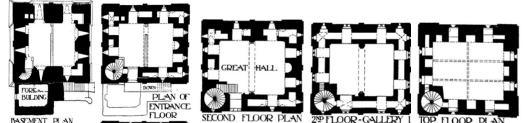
Floor plans of castle represent the heavy walls stereotomics and wall like room (URL 33).
